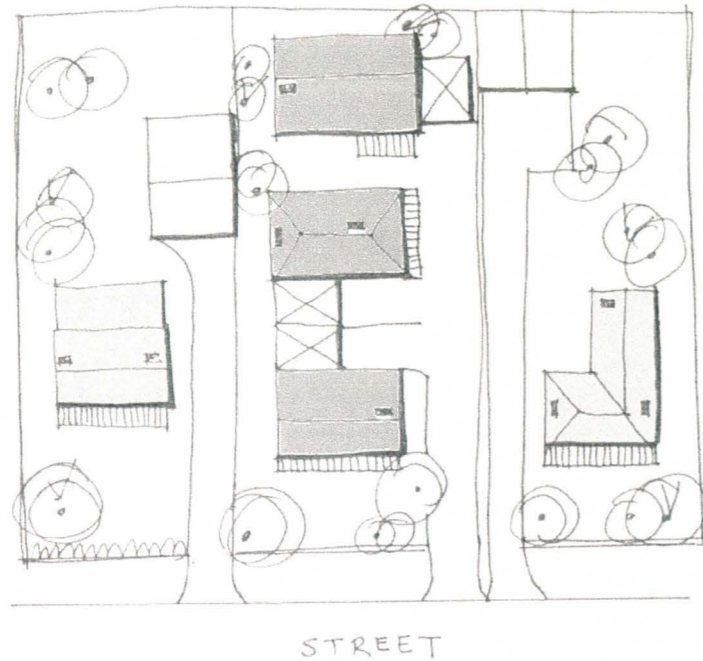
Good example of subdivision where three new buildings are provided on the site. The second and third dwellings are set directly behind the front dwelling to retain a consistent streetscape appearance.
